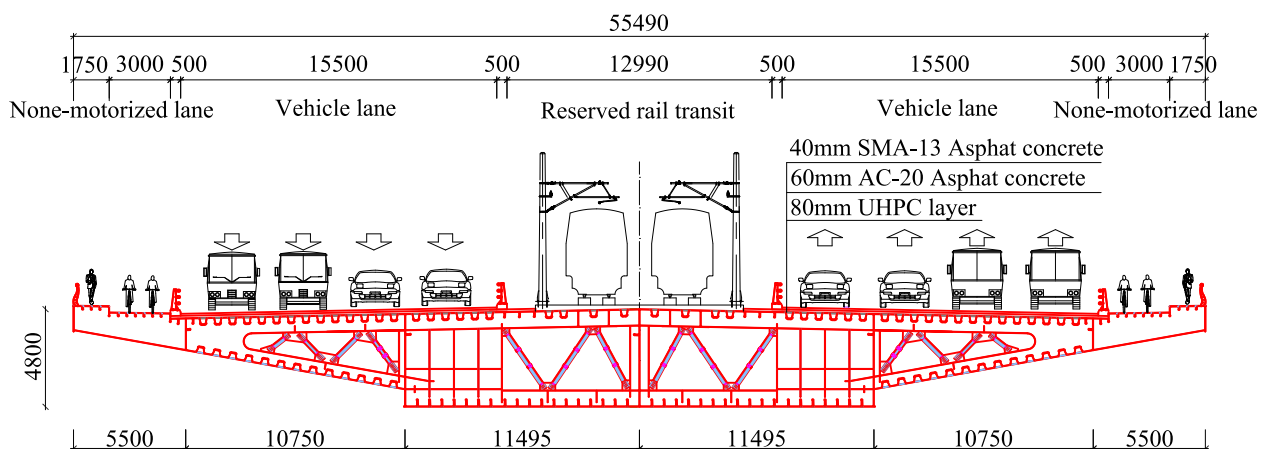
Mid-span cross section of the prototype bridge (unit: mm).
